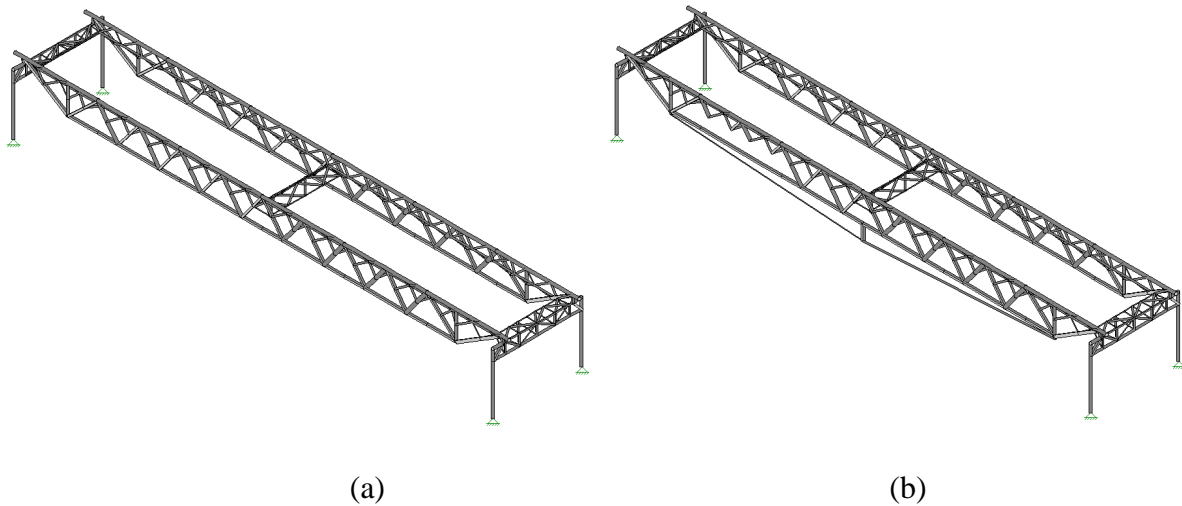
Developed FE model: (a) control; (b) CFRP strengthened (Scenario 1, damage location 1_1)
